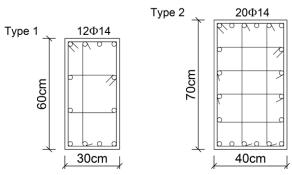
Typical cross section of columns in 3-, 5- and 7-story frames
